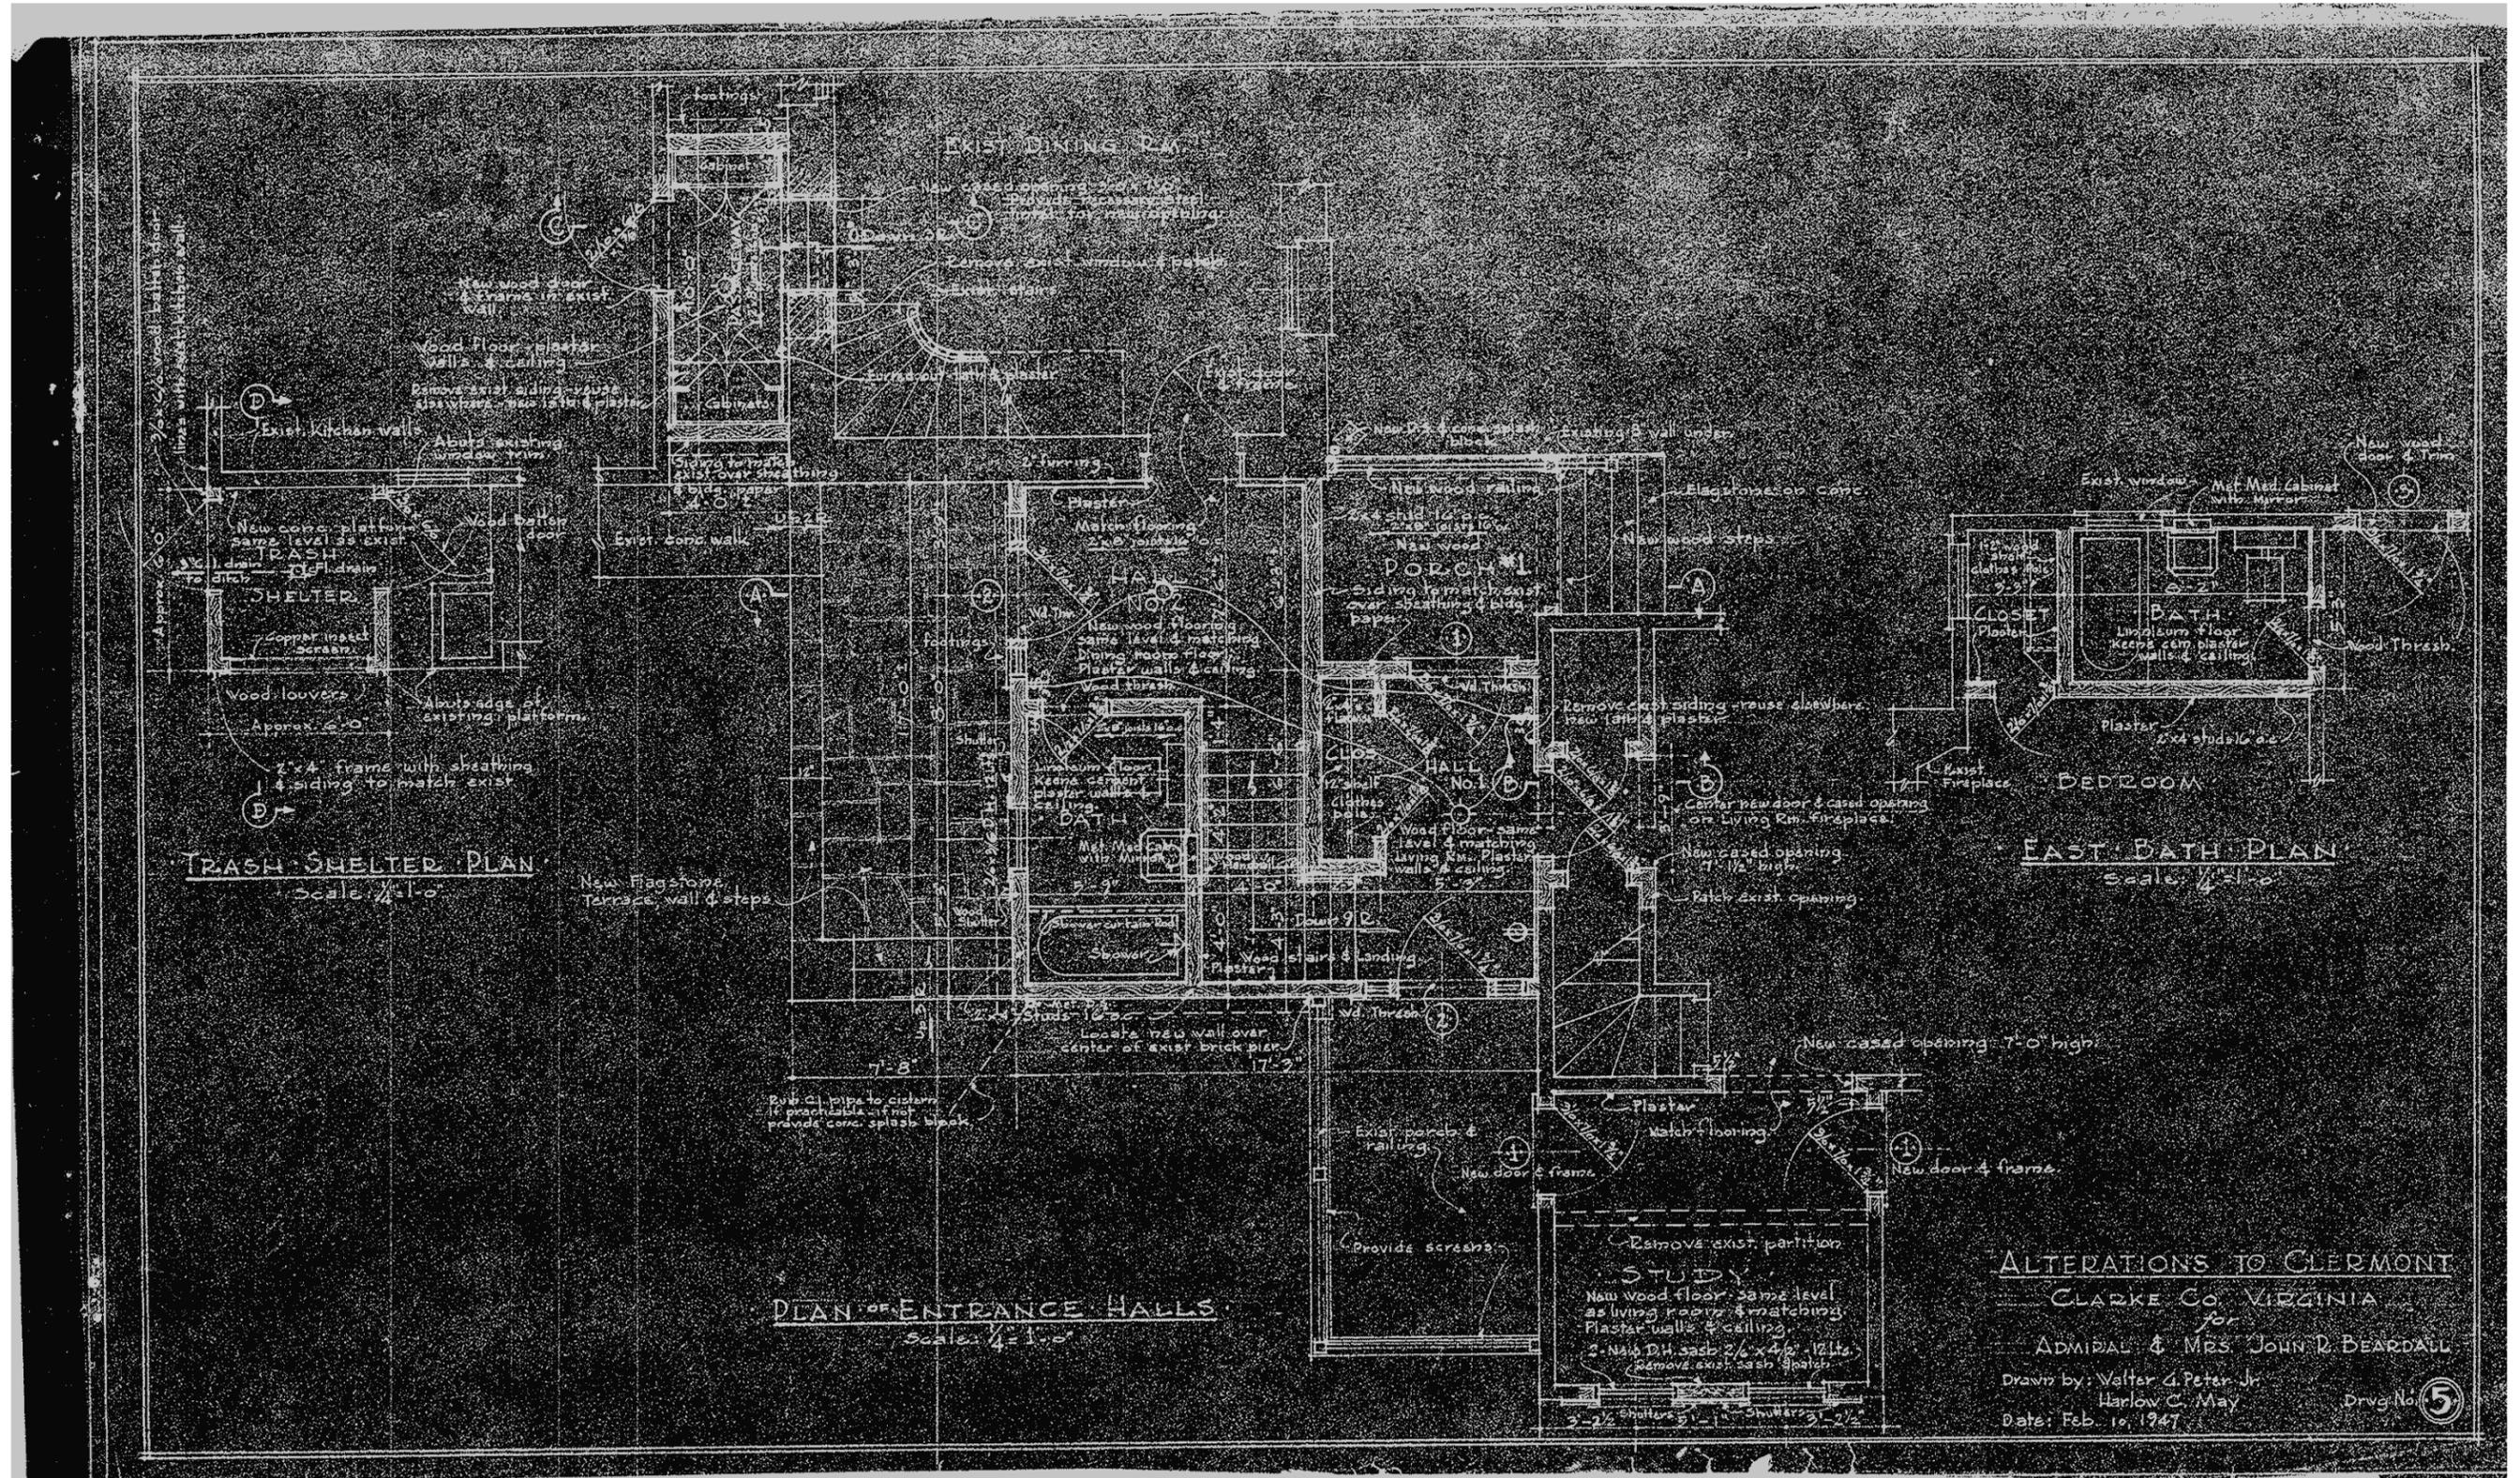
Entrance hall and east bath floor plans of the 1947 alteration construction drawings (not to scale).
